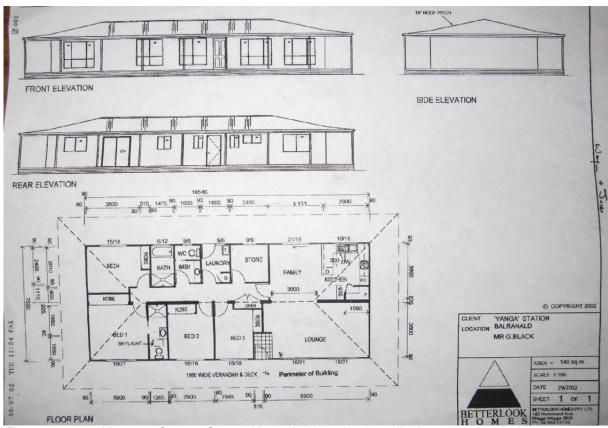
Managers Cottage. Source: Yanga Archives drawing collection.
